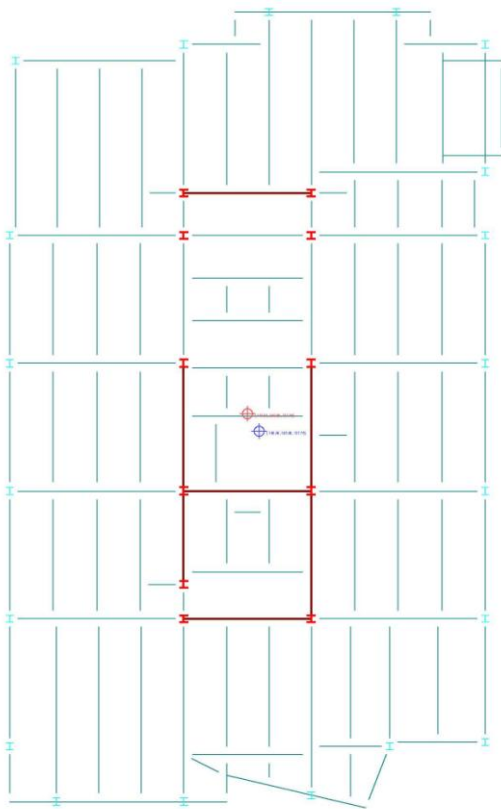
Plan of typical floor showing centers of mass (red) and rigidity (blue).
